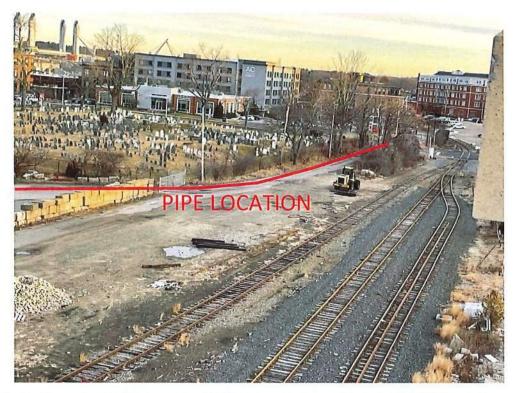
Looking north at 90 Maplewood Ave LLC lot and road between railroad (right) and Old North Cemetery (left). Picture taken from Foundry Parking Garage. Taken 1/19/23
